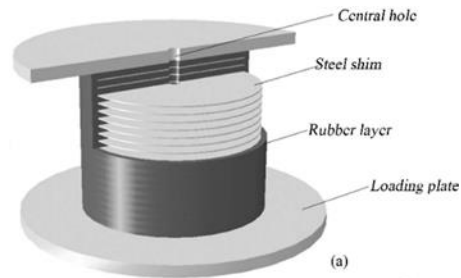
Elastomer bearings. Source (Asl,2014)
